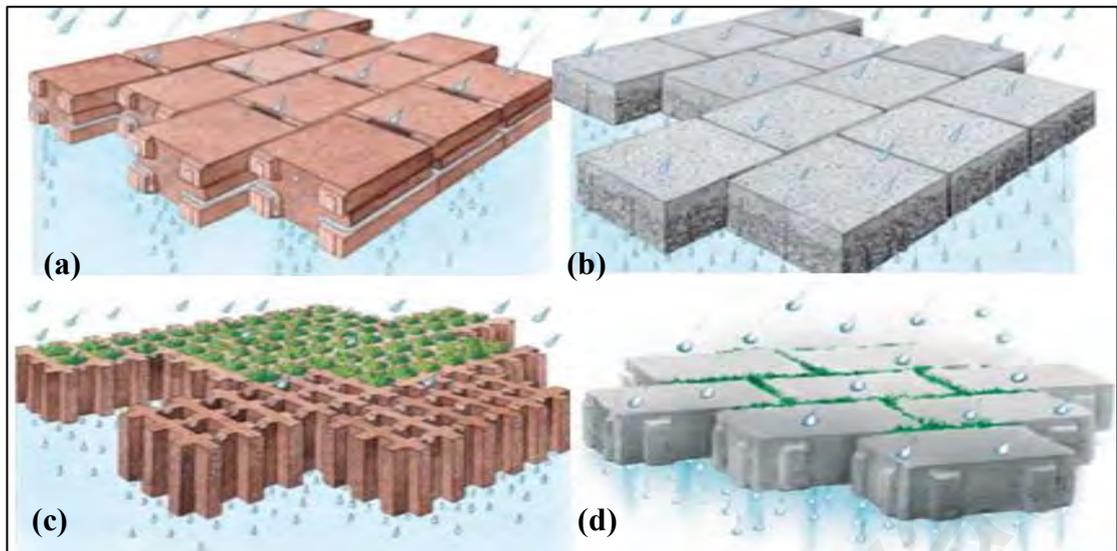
Permeable pavement systems: (a) pavers with canals, (b) porous pavers, (c) small apertures, and (d) wide joints (Source: Dierkes et al., 2000, 2002)
